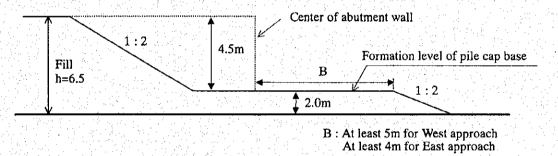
Longitudinal Section of Fill at Pilling and Abutment Construction Stage for West and East Approaches to Viaducts
